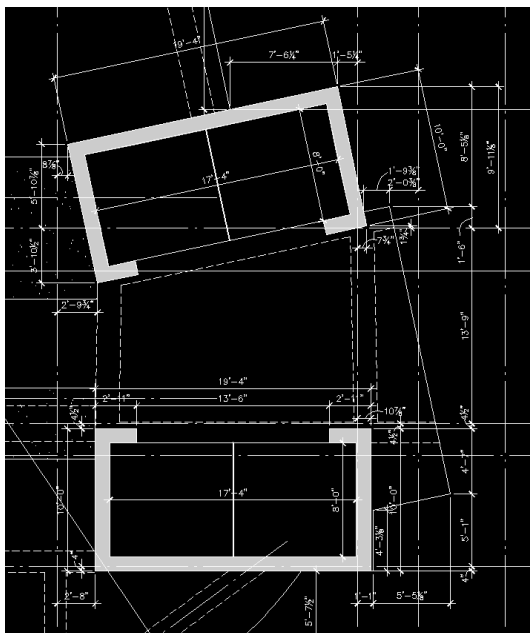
Left – Shear wall located at elevator shafts. Right – Shear wall located at stairwells.
